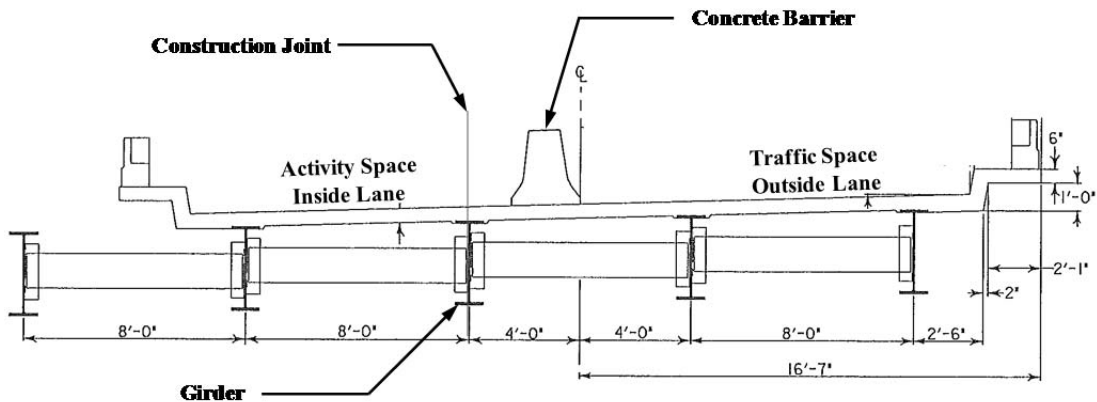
Traditional Construction Sequence TTC Concrete Barrier Placement.
